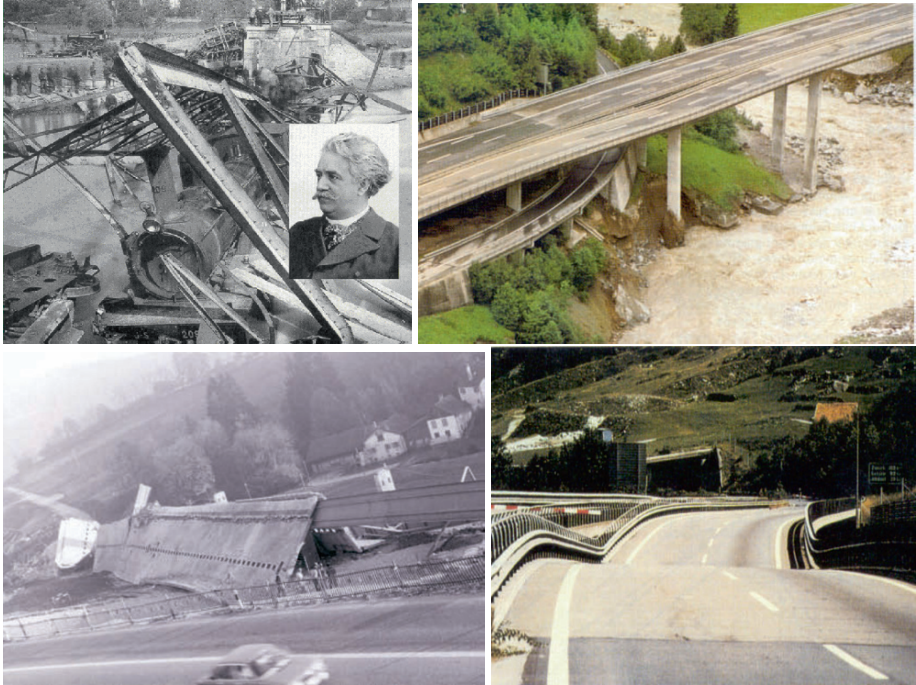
(a) Bridge collapse at Mönchenstein in 1891, (b) scour at the highway bridge at Wassen in 1987, and (c) failure during launching of the deck slab of the composite bridge at Valangin in 1973
